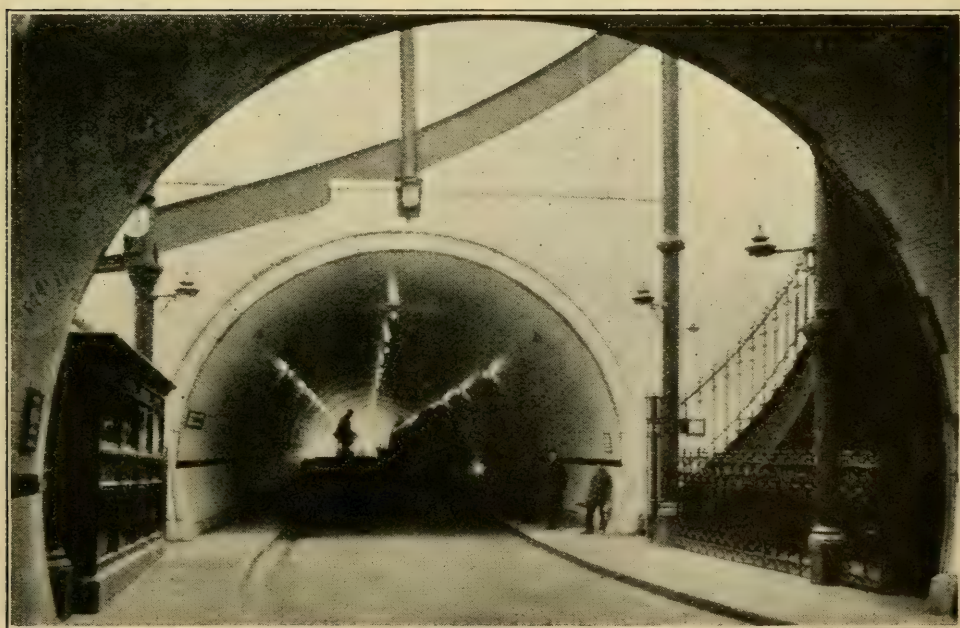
ROTHERHITHE TUNNEL: SPIRAL STAIRS, SHAFT 2.
